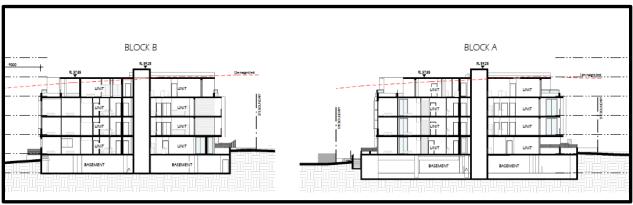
Section 2 of the buildings showing those parts of the buildings exceeding the height limit (courtesy Zhinar Architects)
